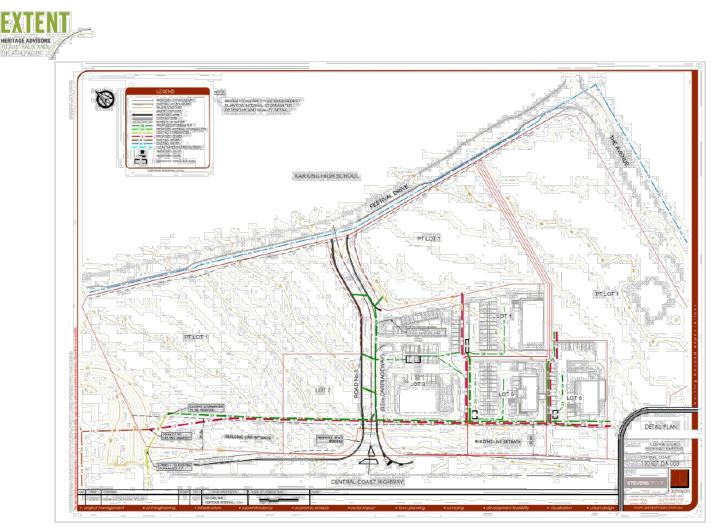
Detail Road Plan showing the network of roadways throughout the development (source: ADW Johnson, Detail Plan, Drawing No.190427-DA-003).
